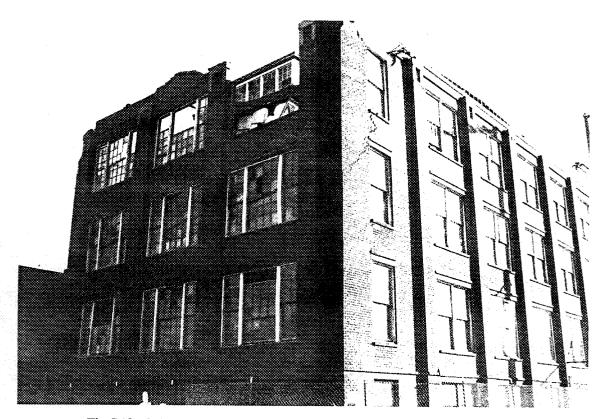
Collapsed roof caused damage to the lower floors in the unreinforced masonry building on Campbell Street in Oakland
